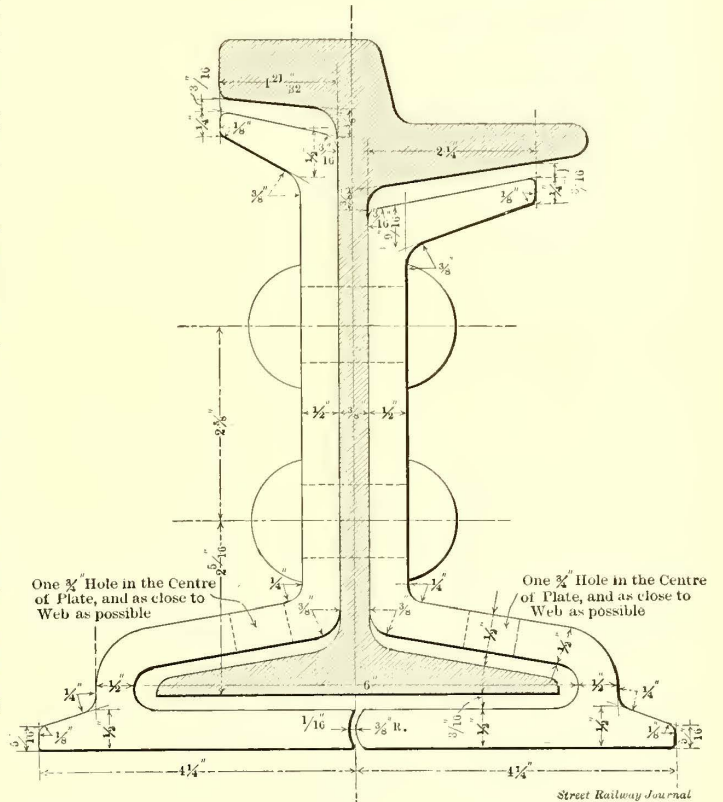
SIDE ELEVATION AND SECTION OF NEW CAST ZINC JOINT
